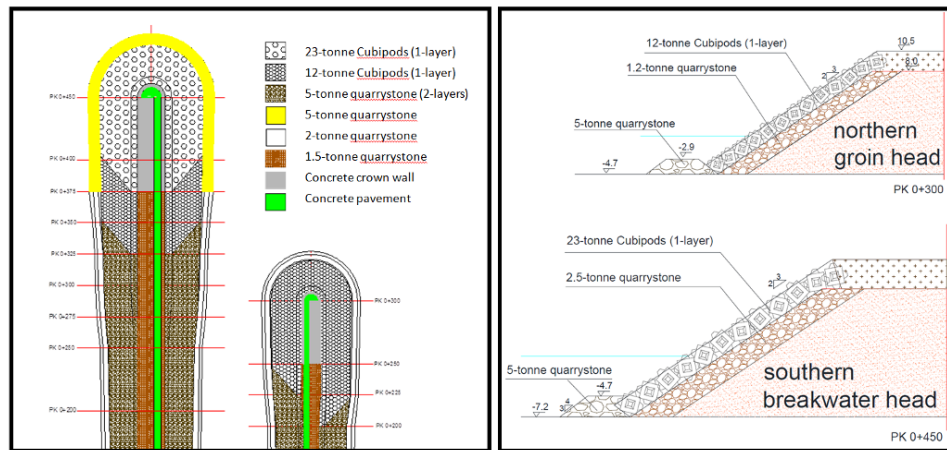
New design with  $H/V=1.5$  slope, single-layer 12.1-tonne and 23.2-tonne Cubipod armors: (a) top view and (b) cross sections (roundheads).
